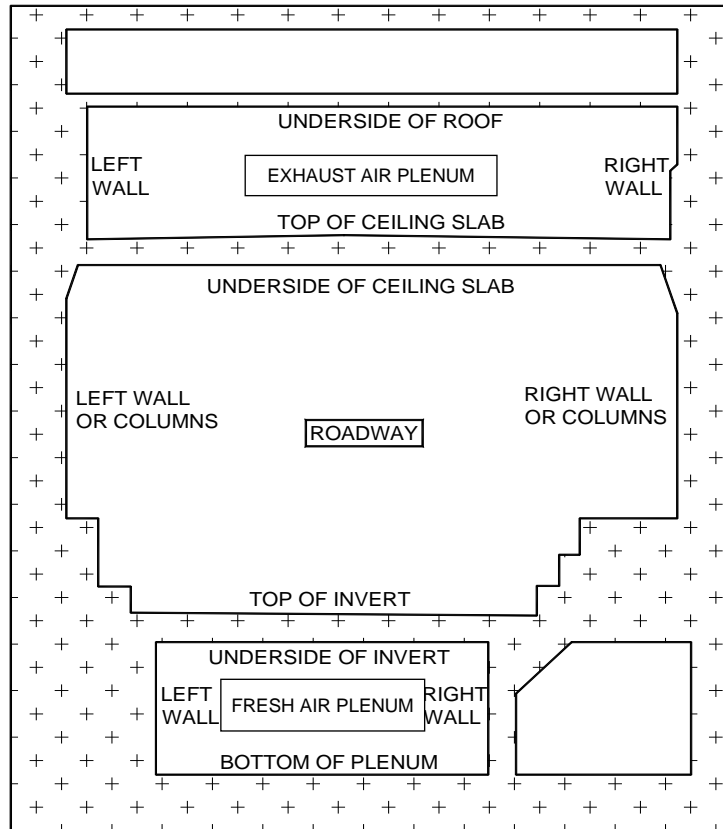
Sample labels used with rectangular shaped tunnel.
